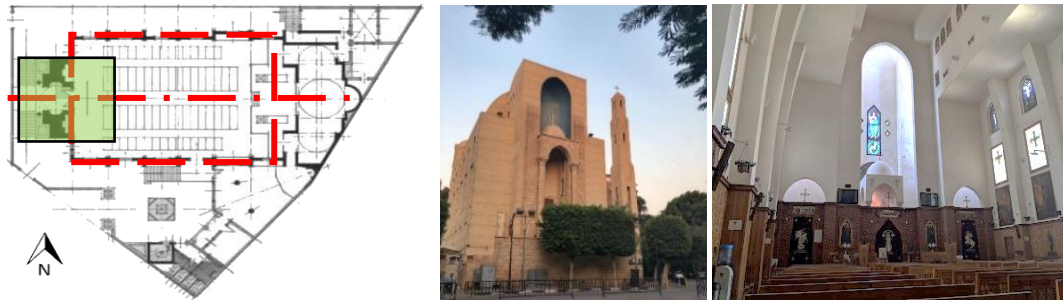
, Virgin Mary - Zamalek church plan, external and internal view (Authors, 2022)
